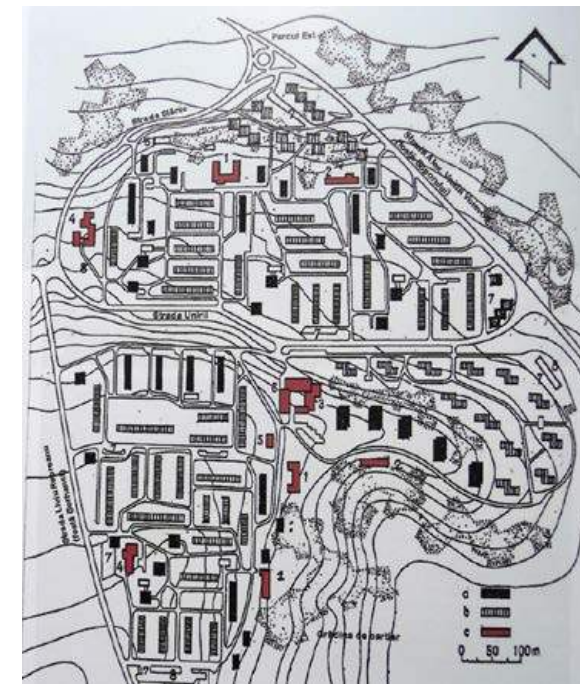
Cluj Napoca, Gheorgheni Neighborhood master plan of microraiions I and II (photo Mitrea, V. 2016) a. 10-11 floors apartment buildings b. five floors apartment buildings c. public facilities: 1 – schools; 2 – kindergarten; 3 – commercial and administrative neighborhood centers; 4 – commercial complexes; 5 – clinics; 6 – movie theater (not built); 7 – parking lots; 8 – collective garages.
